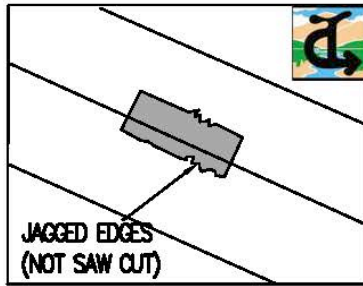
Example 4: In concrete pavements, remove sections to existing joints.
